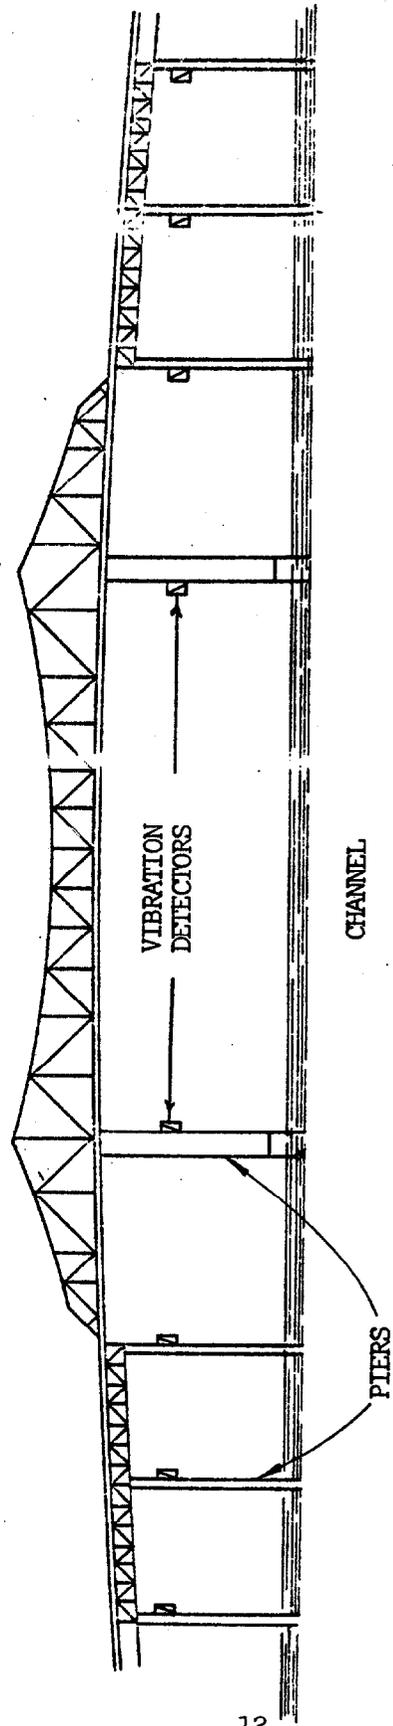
PIER VIBRATION SYSTEM FOR SUNSHINE SKYWAY BRIDGE
